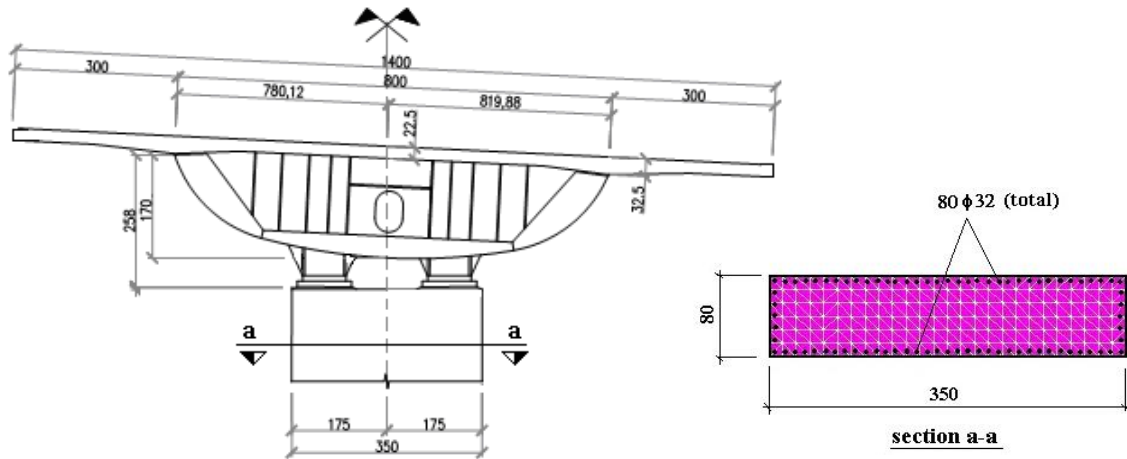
The cross-sections of the superstructure and the piers (all dimensions in cm)
